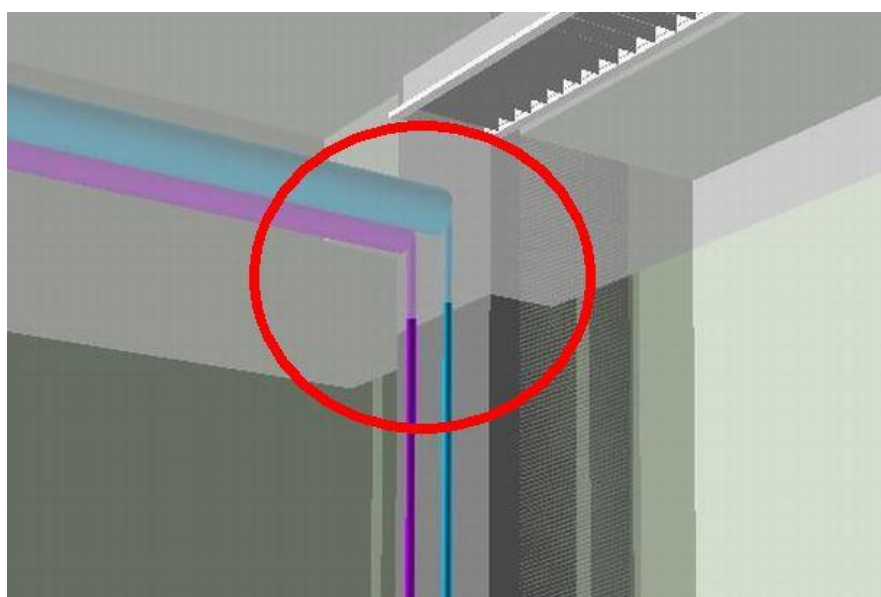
Example of pipes in a suspended ceiling where the horizontal part of the pipes is insulated but the part going downward (inside the suspended ceiling) is not.
